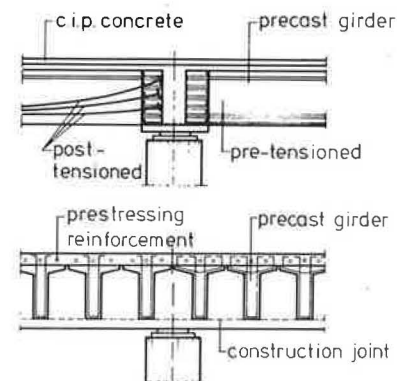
Span-by-span construction with precast girders—section through main girder and cross girder.
